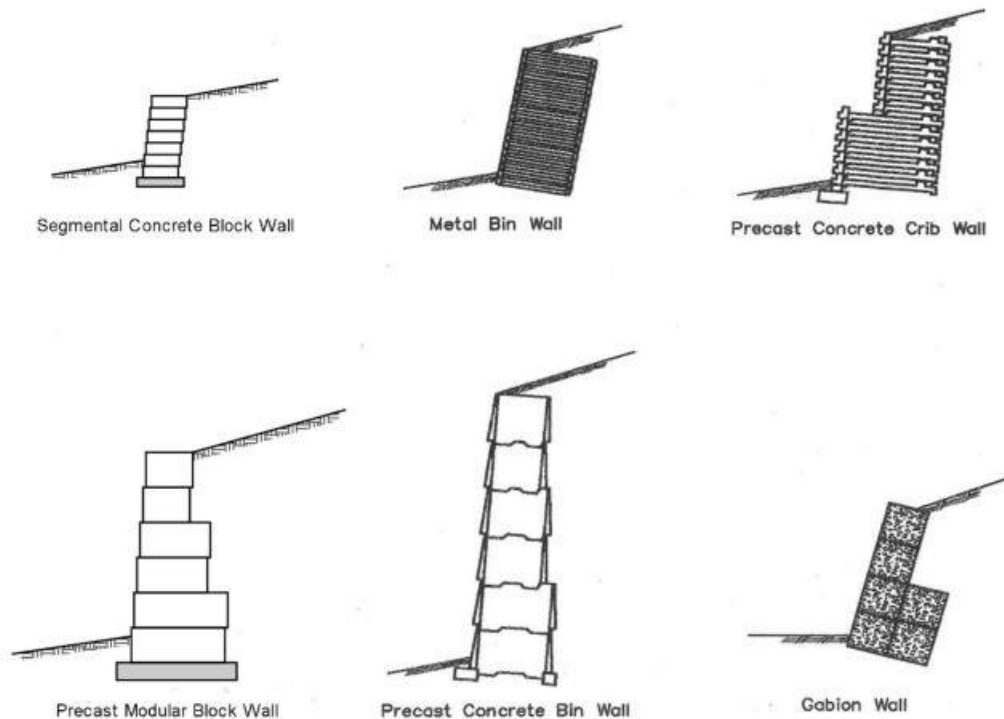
Typical Prefabricated Modular Gravity Walls
